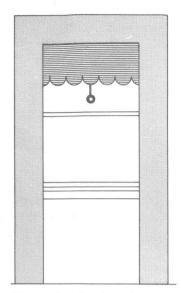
Lambrequin — a wood frame covered with fabric, wallpaper, or paint which surrounds double-hung window sash.
